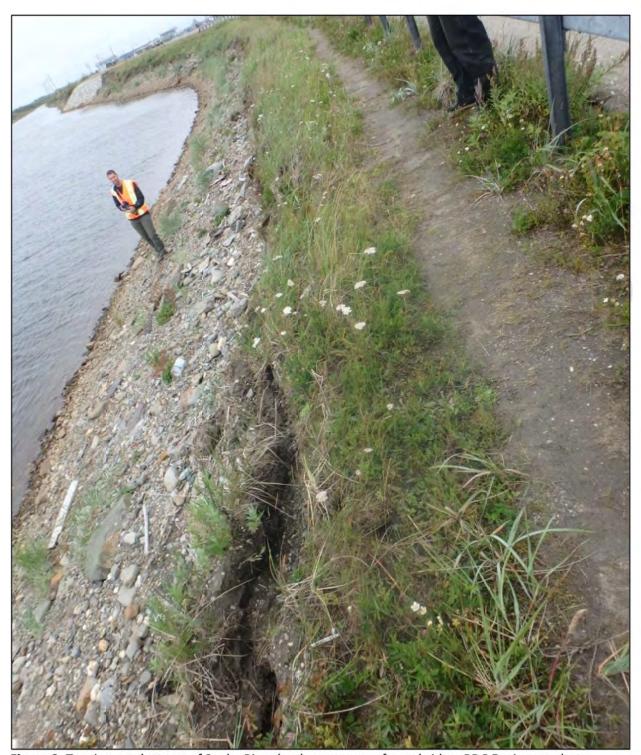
Tension crack at top of Snake River bank, upstream of new bridge. PDC Engineers photo.
